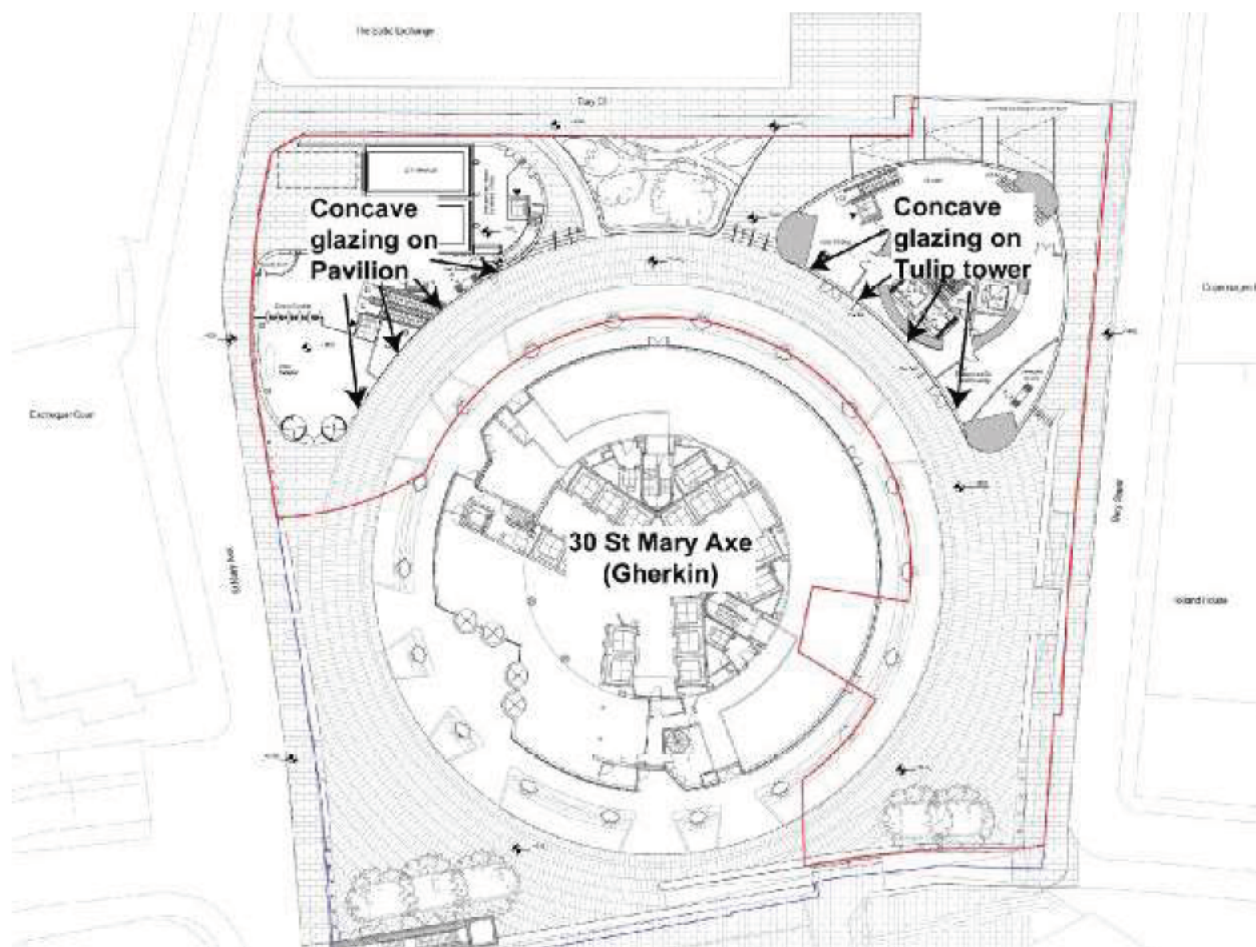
Ground floor plan by Foster and Partners, annotated to show location of concave glazing elements.
